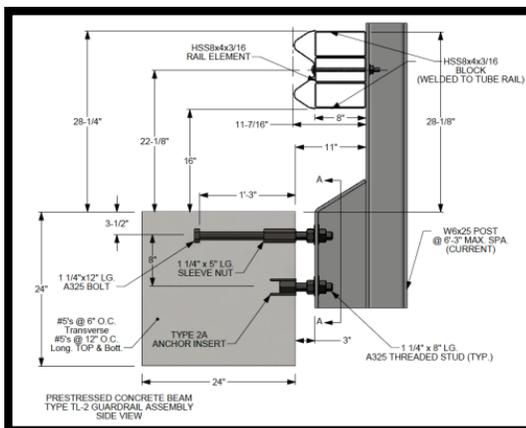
Original WVDOT Guardrail at 28 3/8" Height
